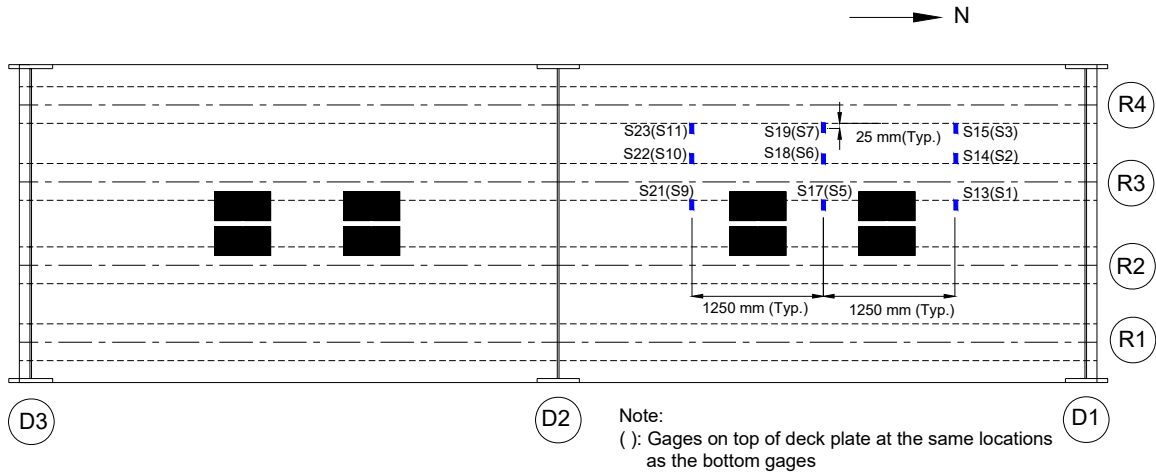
Specimen 1: Uni-axial Strain Gages in Deck Plate near Rib-to-Deck Welds
